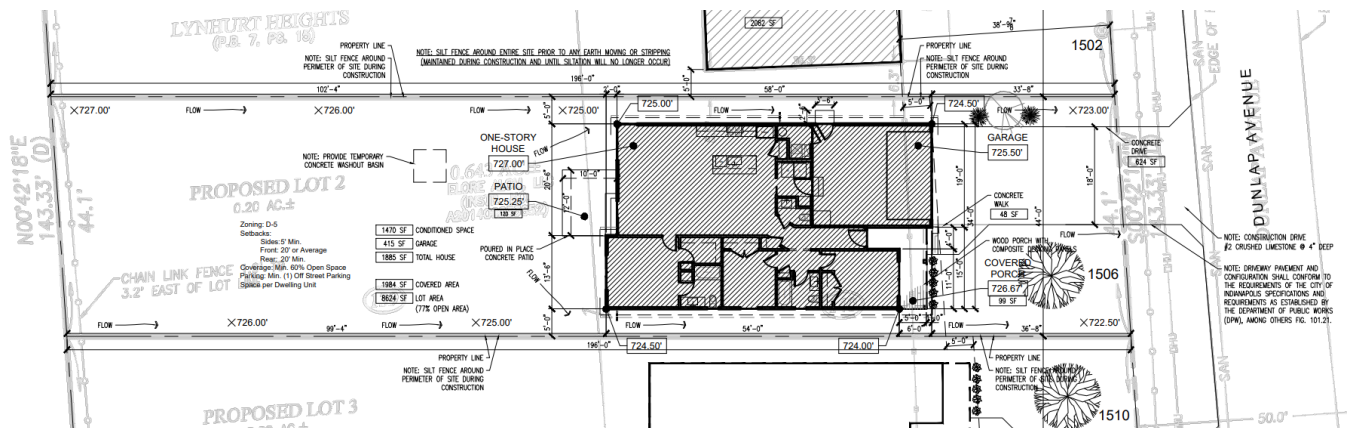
1506 Dunlap Avenue enlarged site plan.
